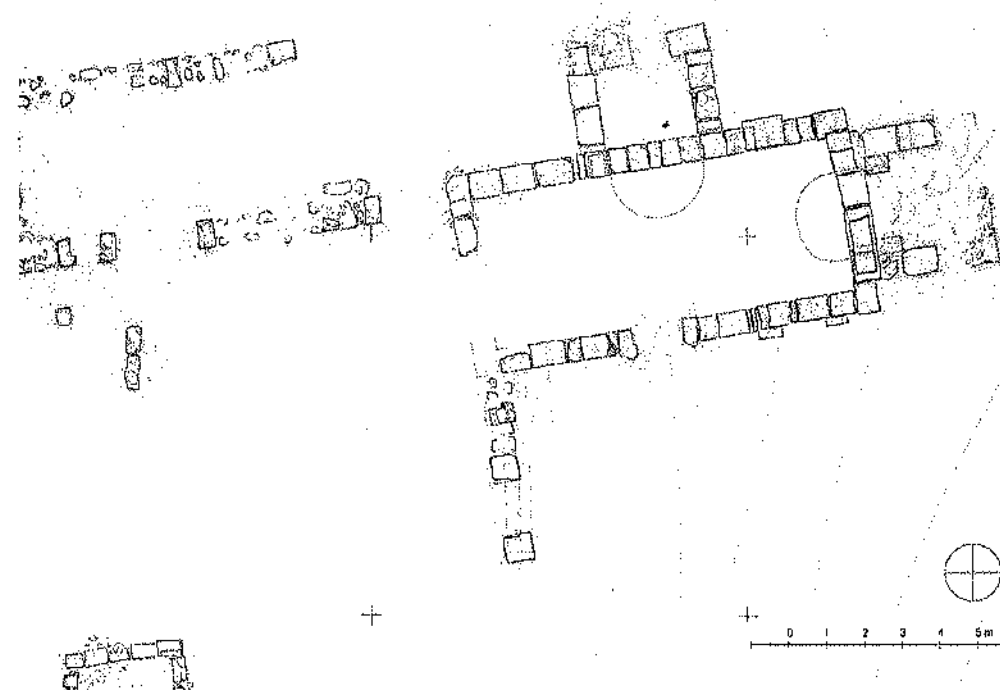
Keloşk Kale, ground plan of Building 2 (scale 1:200).
